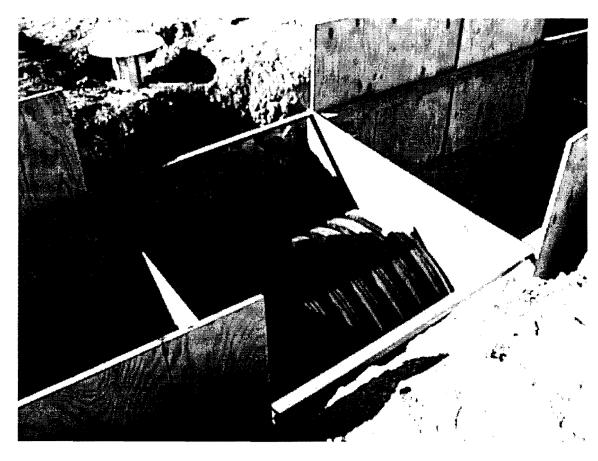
A Pipe Section Ready for the Placement of Backfill.
